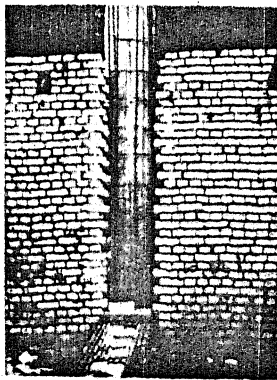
STRENGTHENING OF BRICK MASONRY WITH REINFORCED CONCRETE POSTS
